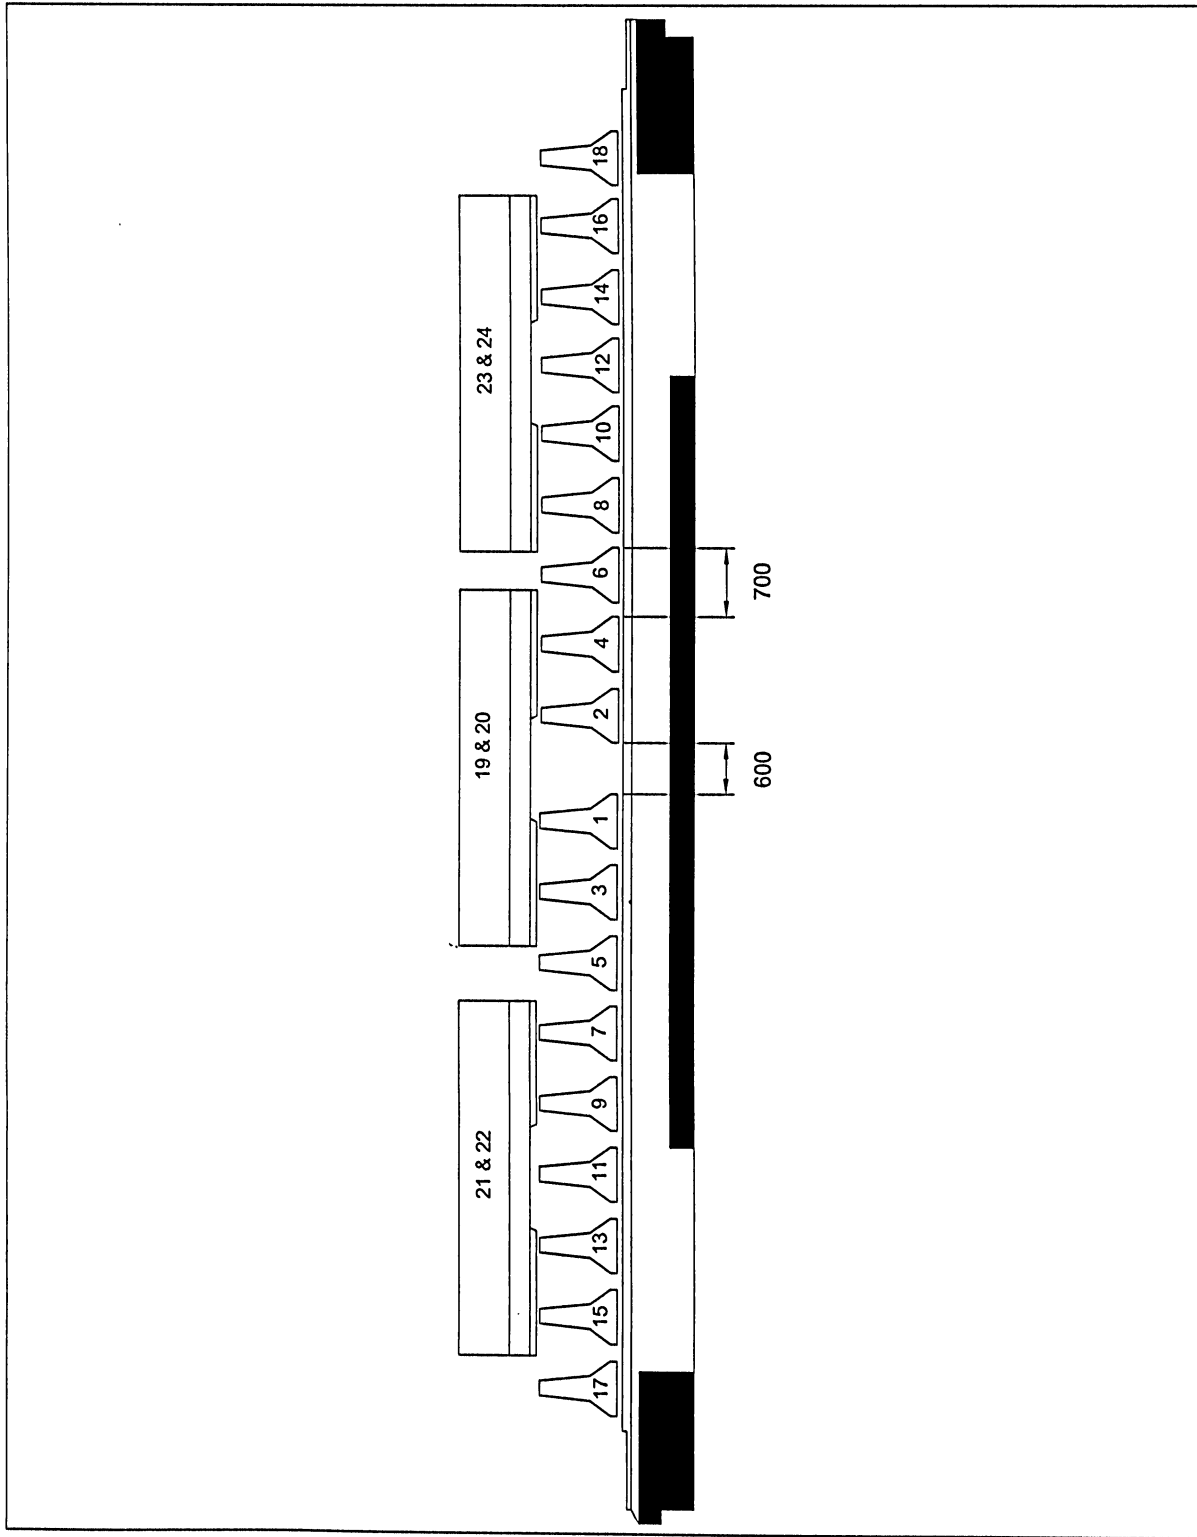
DT-102A girder barrier load application (Cofini, 2005)
